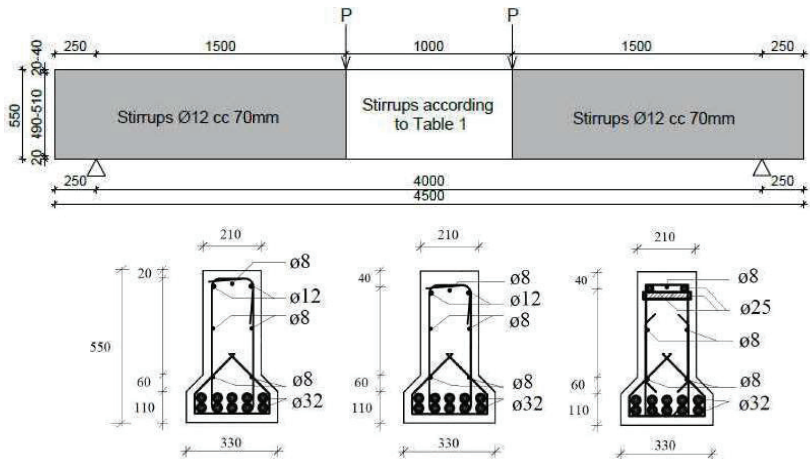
Beam geometry and reinforcement layouts between the loading points. Dimensions are in [mm].
